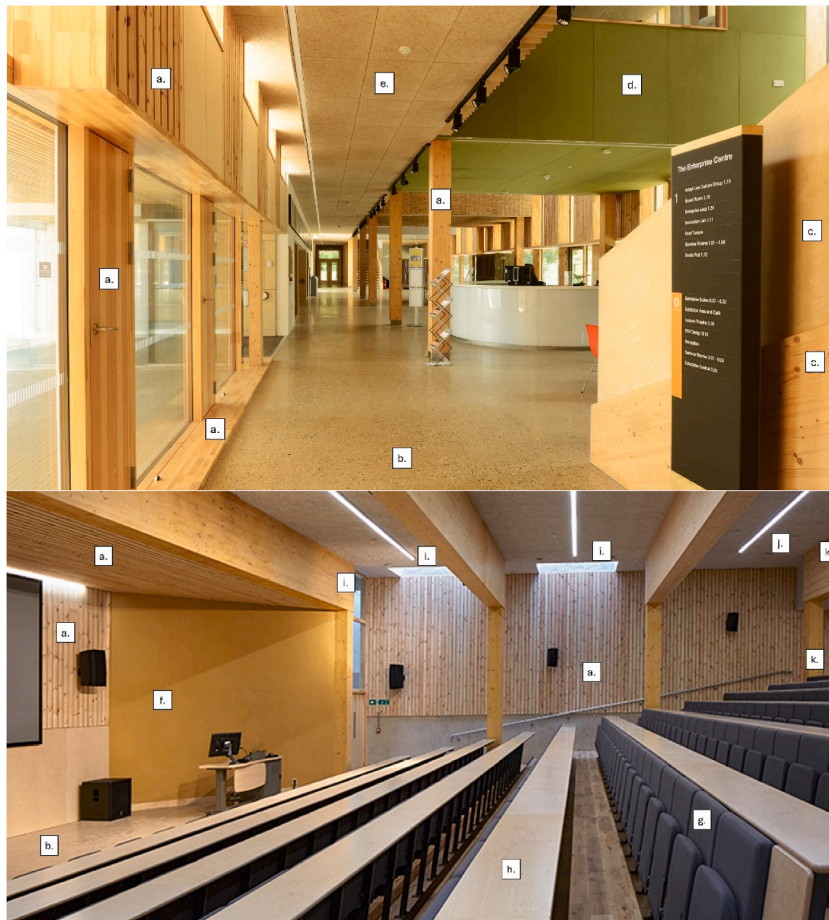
Annotated internal spaces of The Enterprise Centre by ARCHITYPE [44] (Note: a. Natural finish timber; b. Polished concrete floor; c. Ply and Glulam staircase and balustrade; d. Nettle fabric cladding board; e. Strawboard removable ceiling tiles; f. Clay plaster walls and natural paints; g. Hemp fabric seating; h. Birch ply writing shelf; i. Sky lights and borrowed lights; j. Spray on cellulose sound insulation; k. Glulam structural beams and columns).
